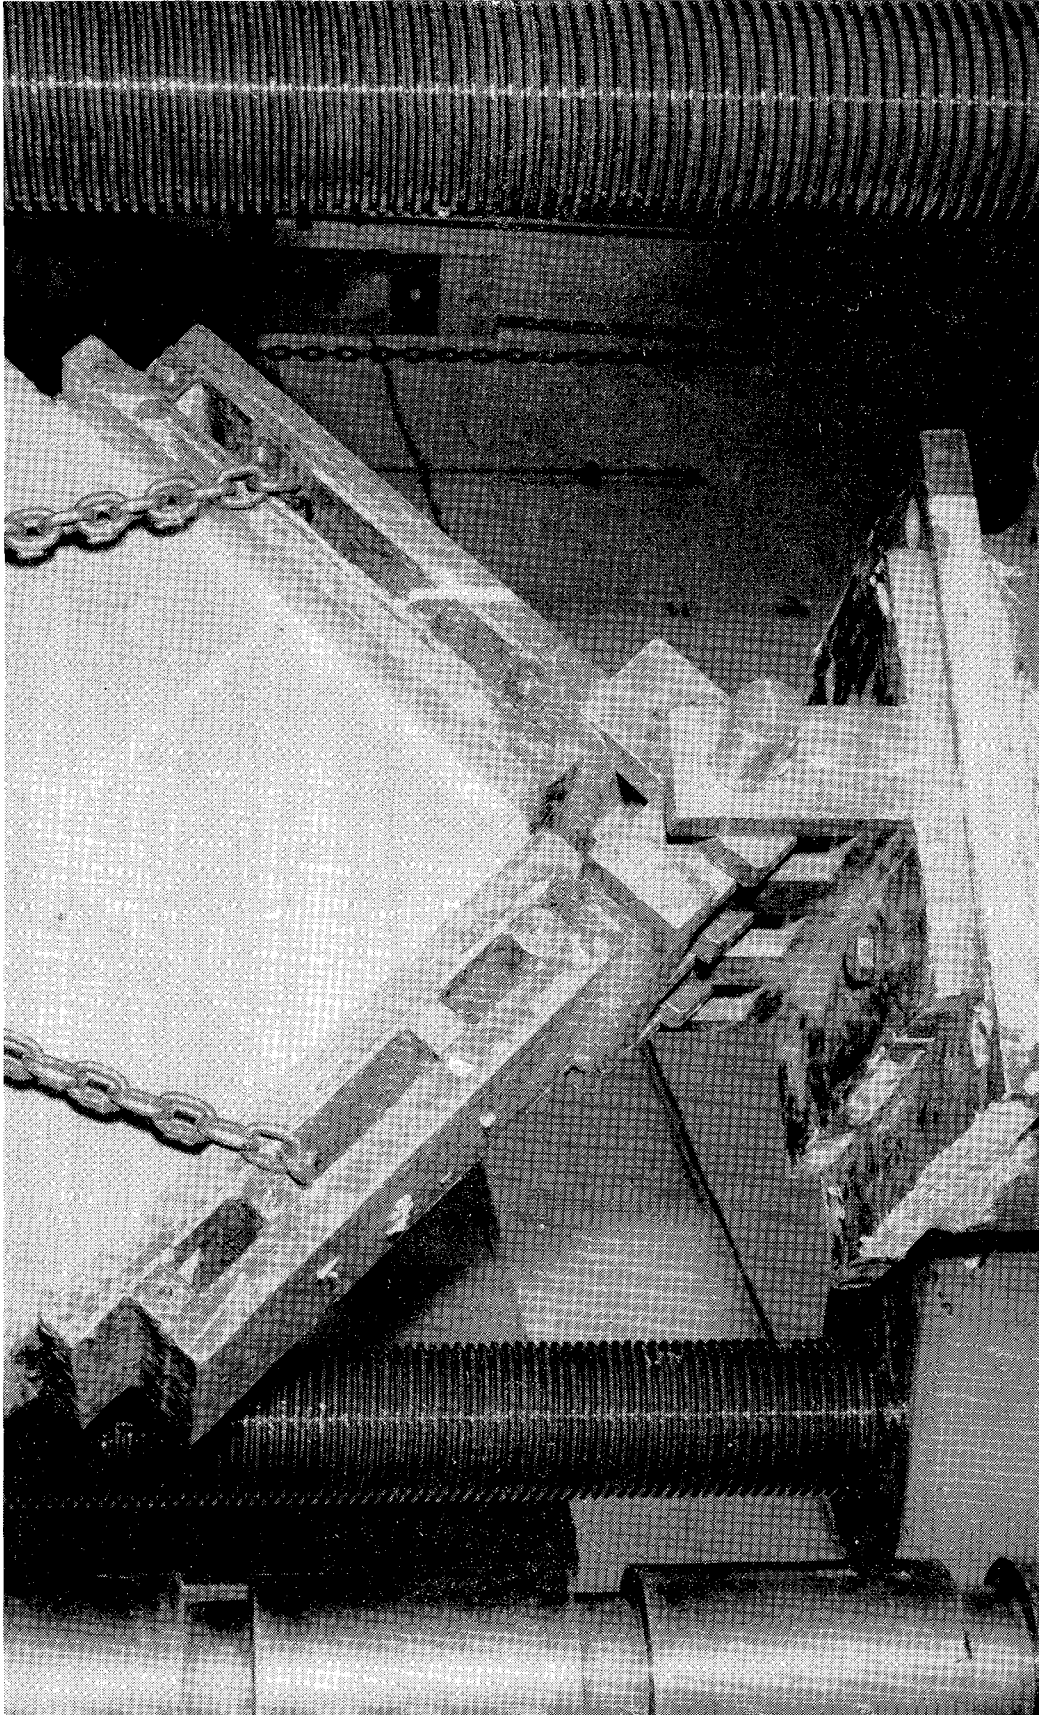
CLOSE VIEW OF MODIFIED TEST SETUP
